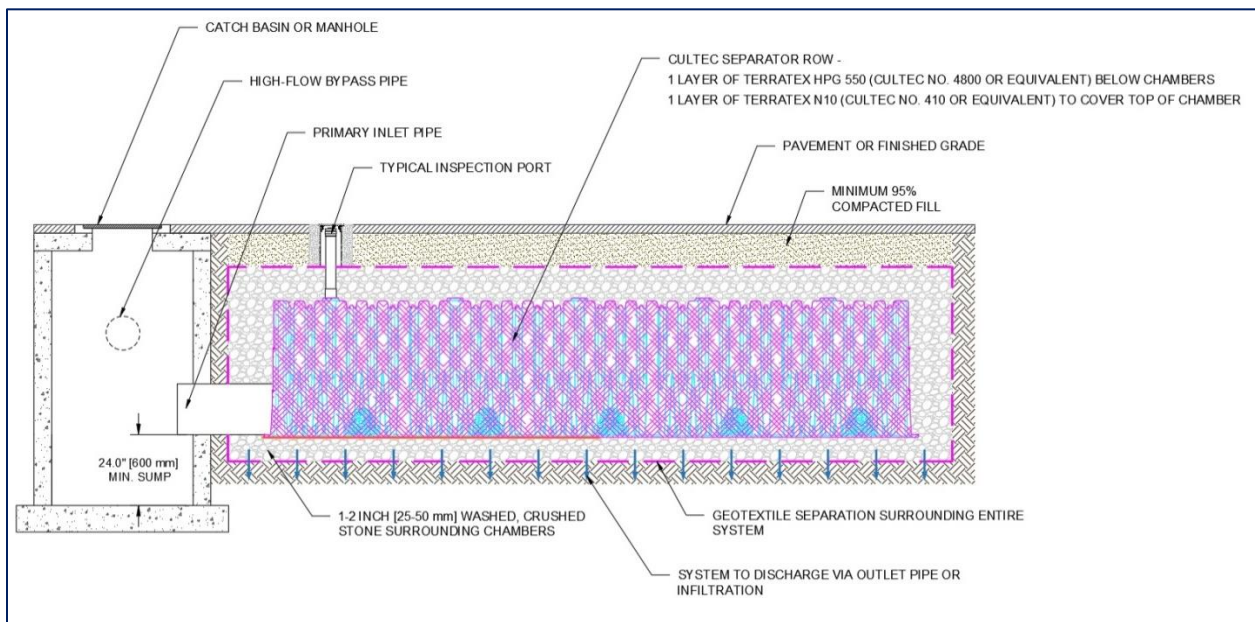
Cultec Separator™ Row Filtration System – Cross-Sectional View
